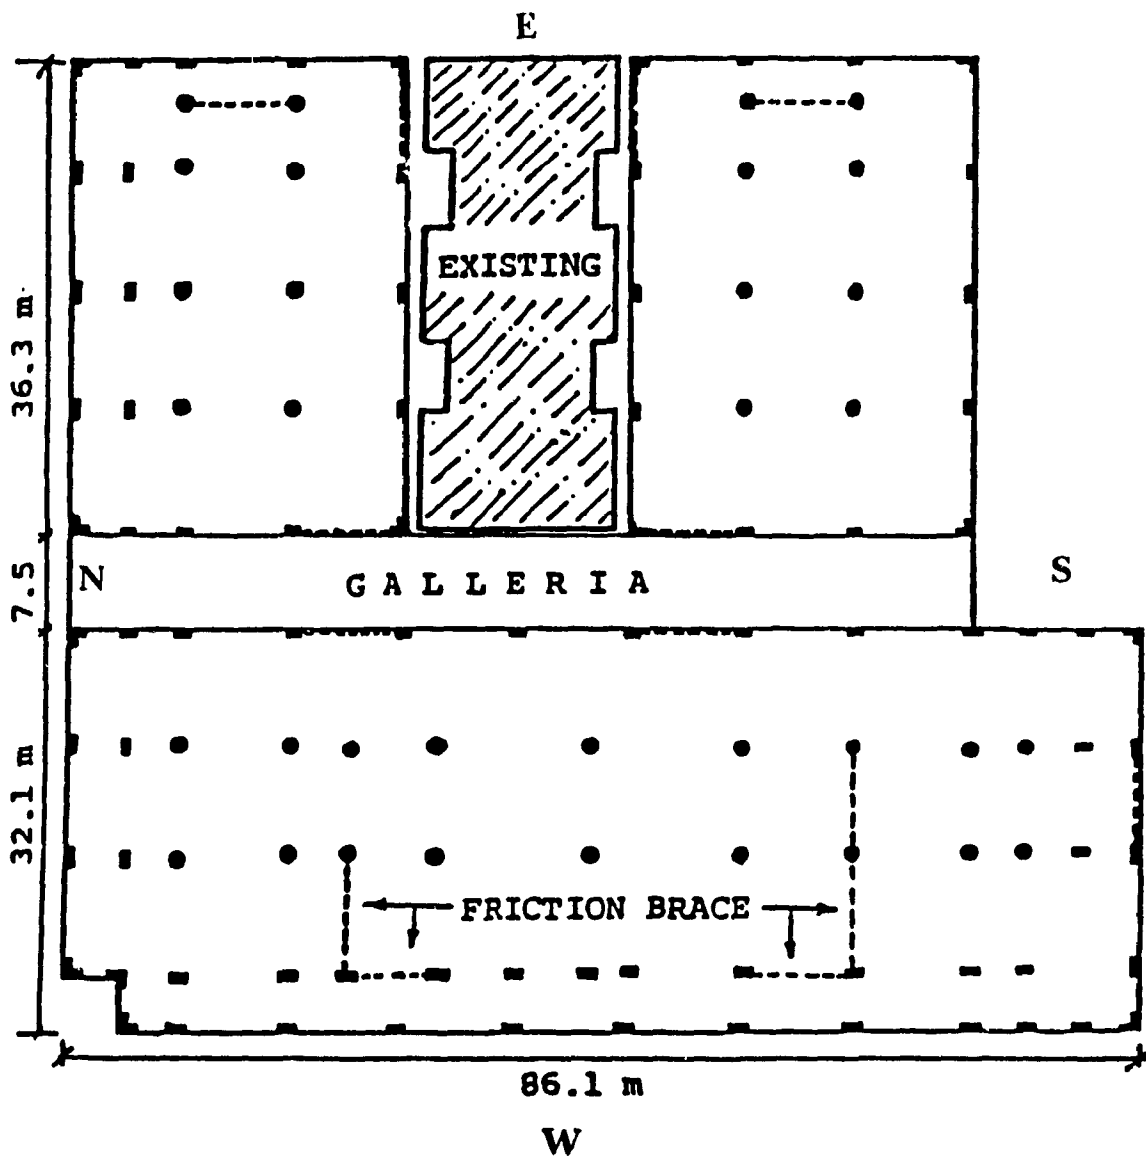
Plan View of the New Concordia Library Building Complex[24]
